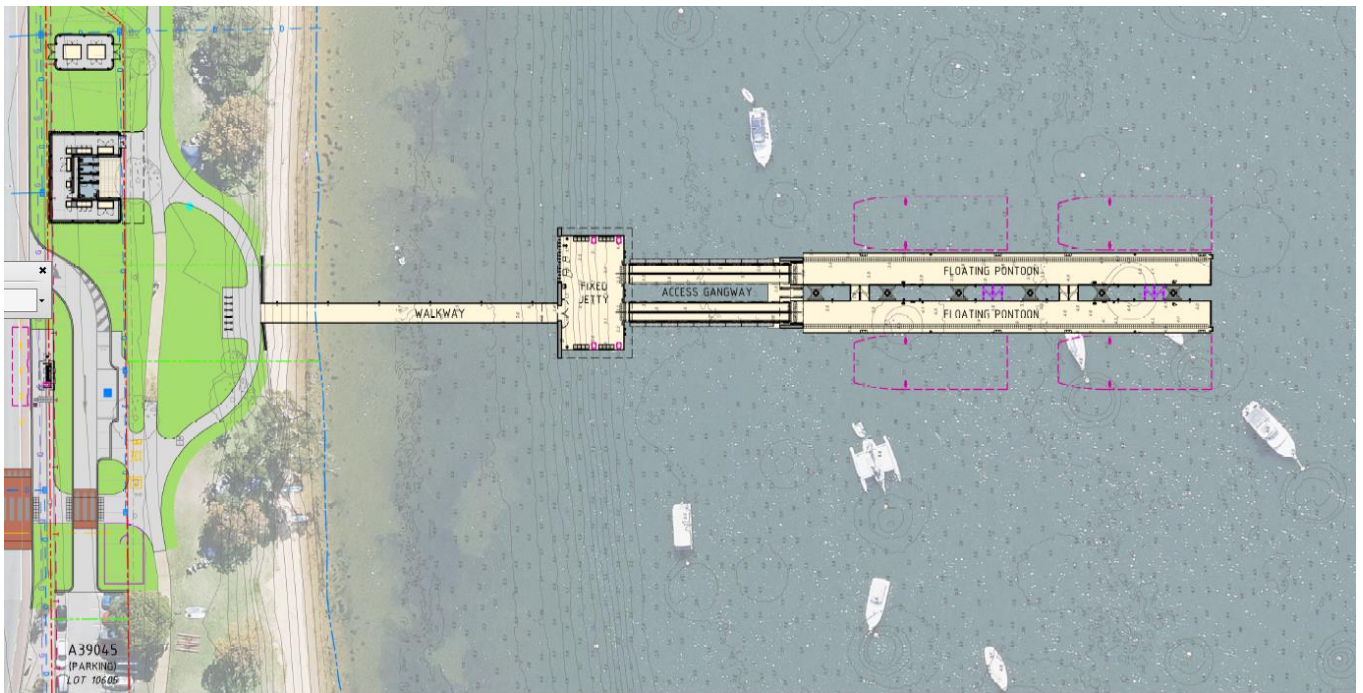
Layout of proposed Matilda Bat ferry Terminal (Reference: Matilda Bay Ferry Stop – Overall Site Plan, 24.602-SK03-A)
